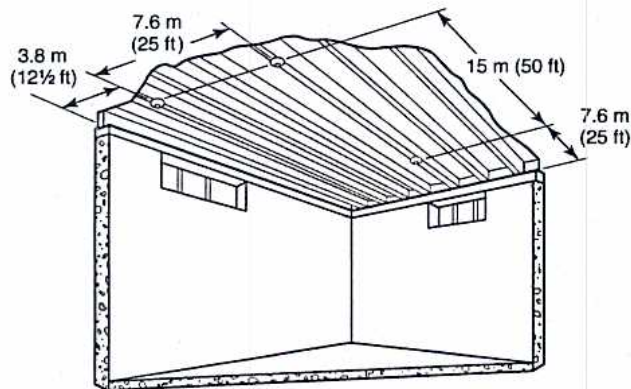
Open Joists, Attics, and Extra-High Ceilings are Some of the Areas that Require Special Knowledge for Installation.
